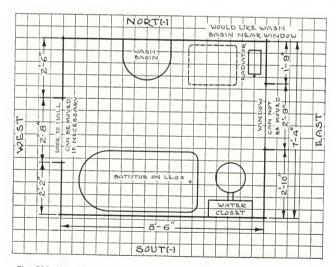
Use of Graph Paper to Plan Bathroom Layouts in Remodeling
